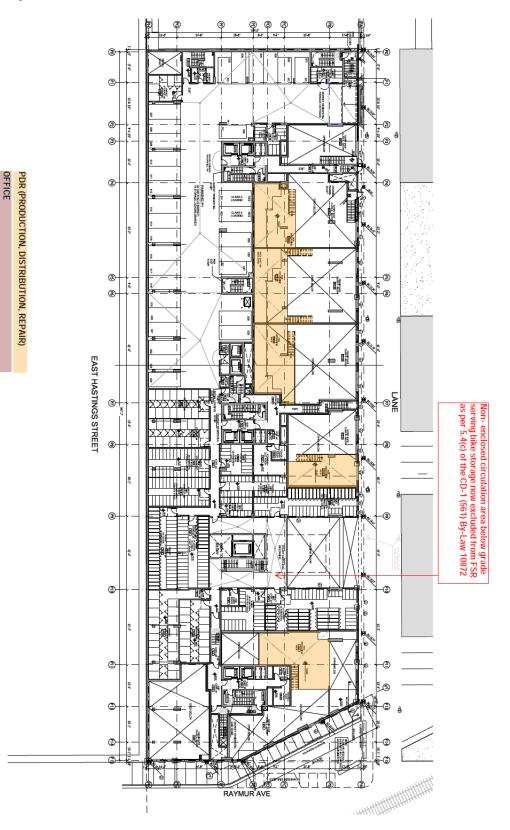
P1 Floor Plan (includes industrial mezzanine and circulation area)
